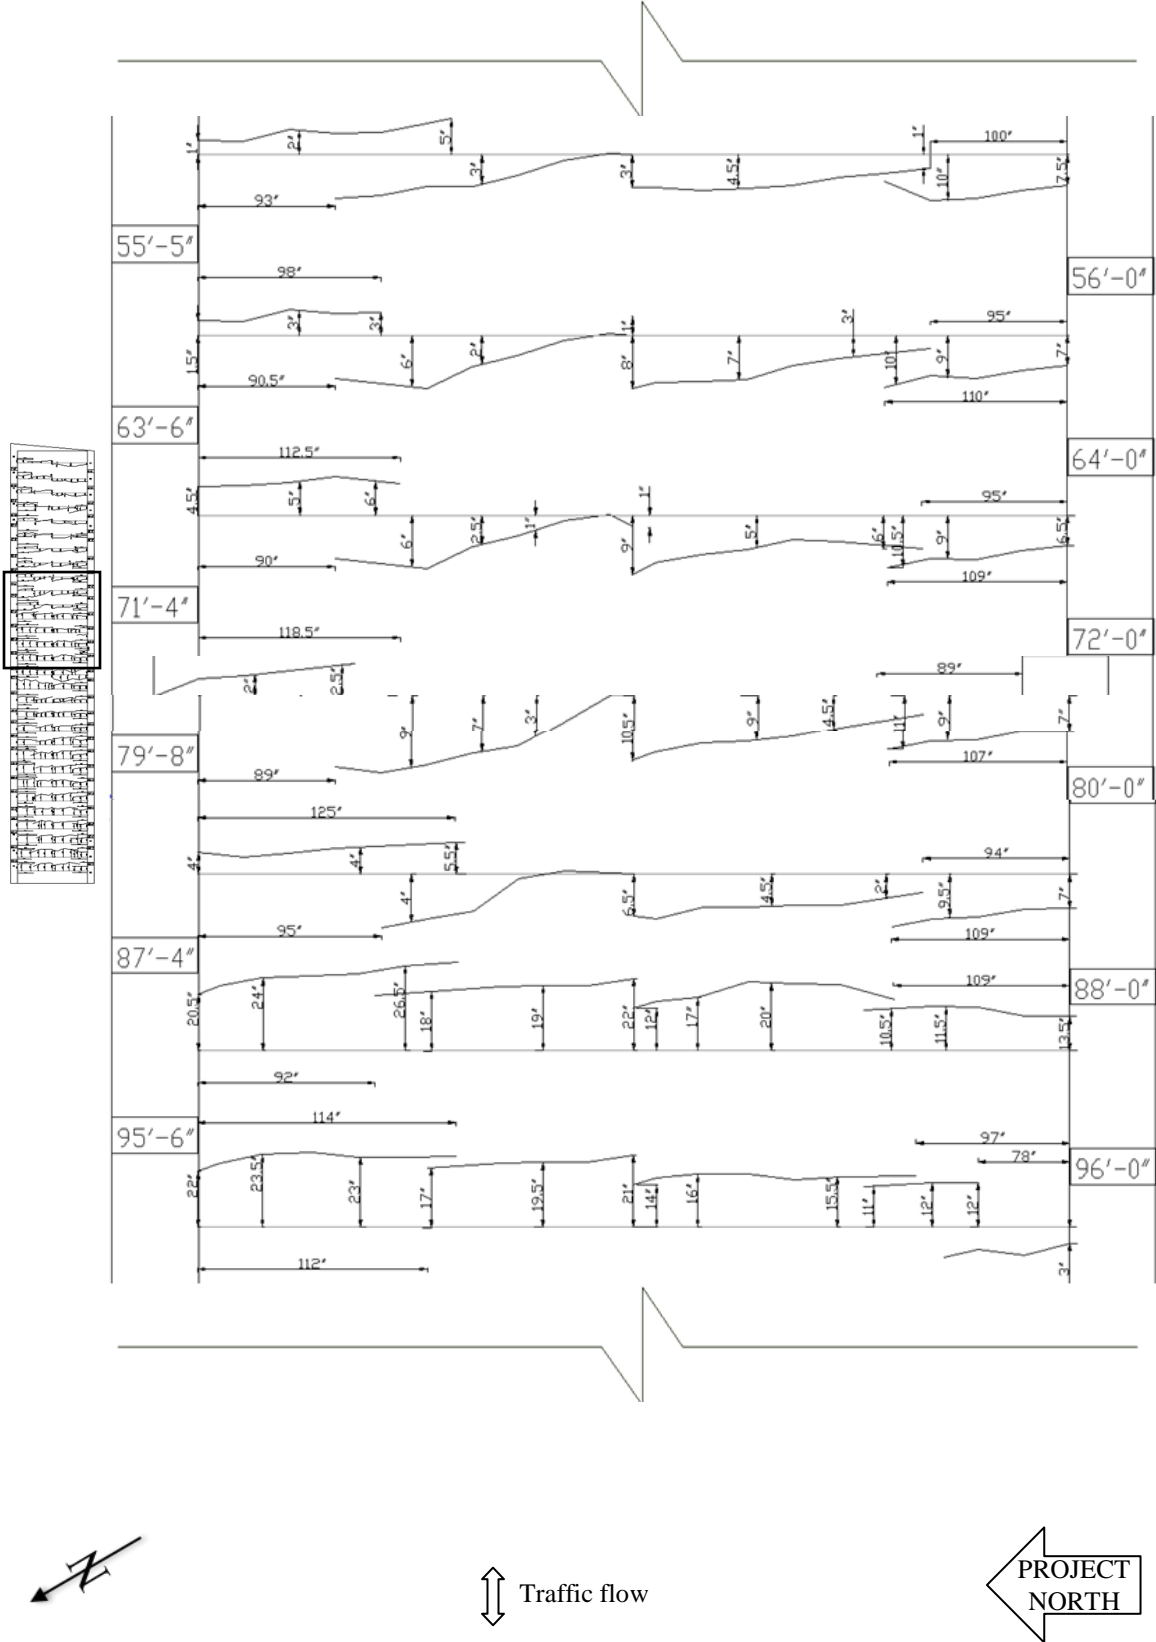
Visual Inspection Data from the Top Surface of the Bridge Deck - Crack Map and Drain Locations – Bridge A4709 (Cont.)
